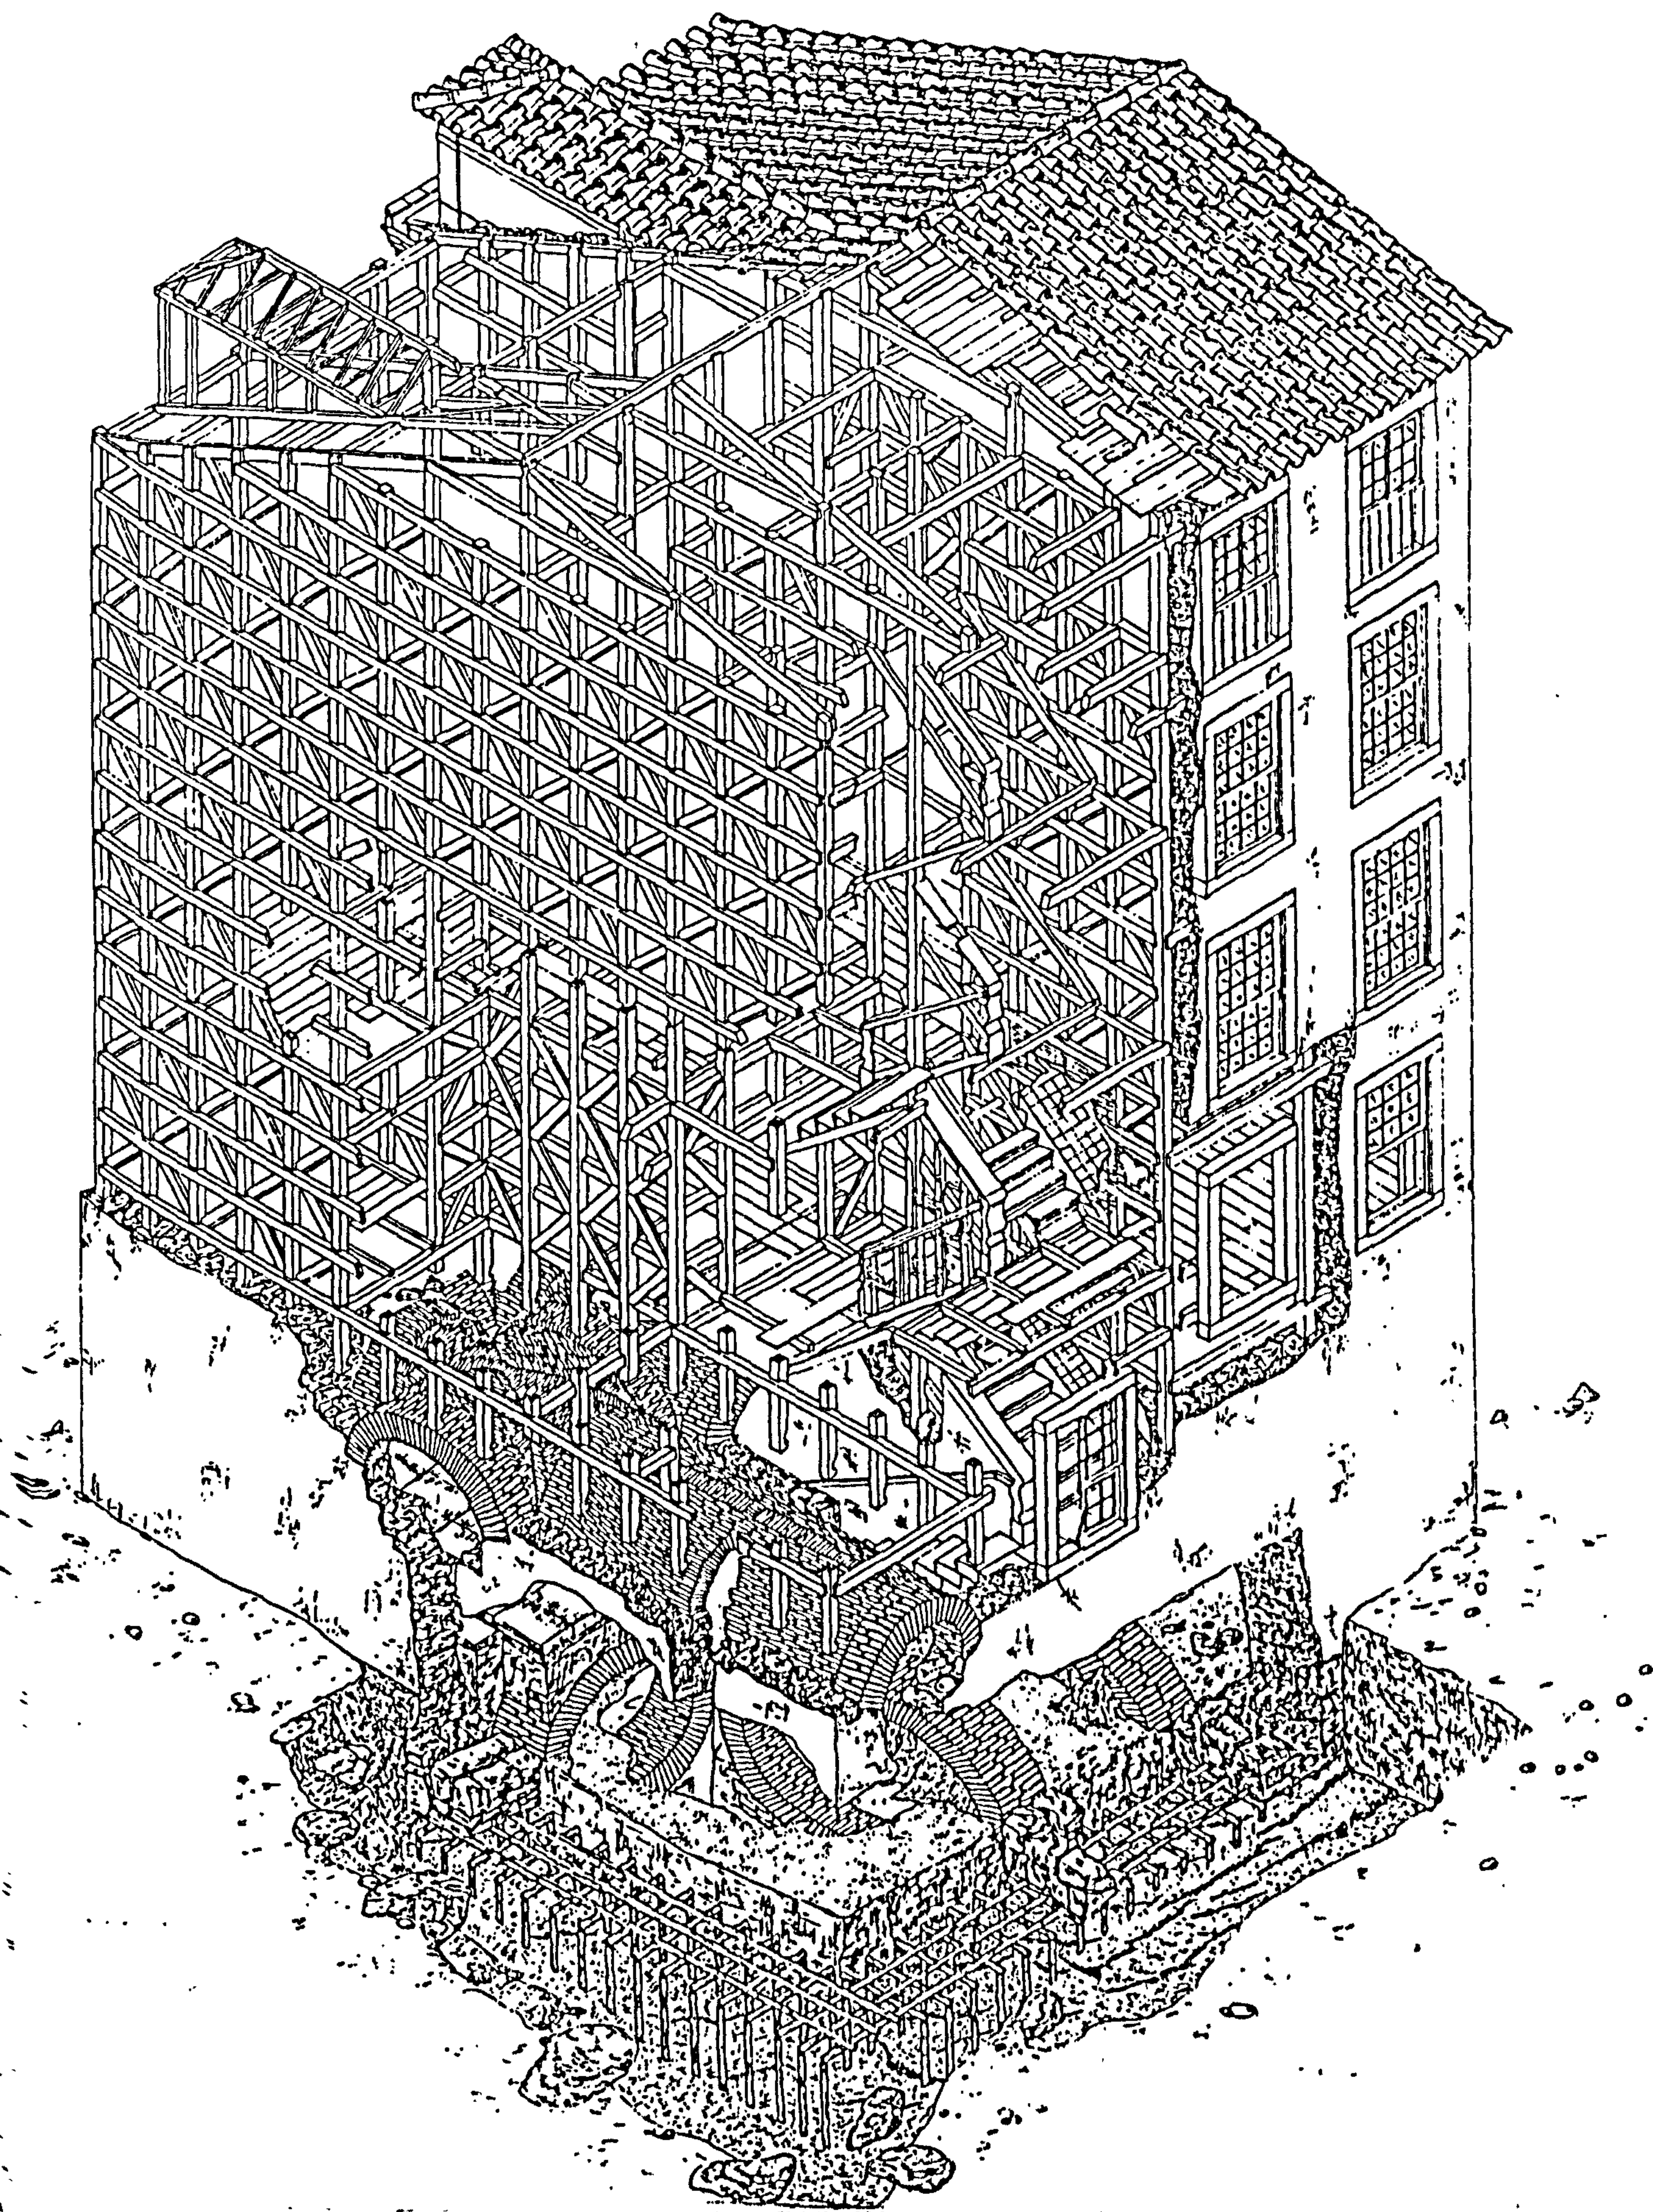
Isometric from *alfugere* showing the construction, (building M)
